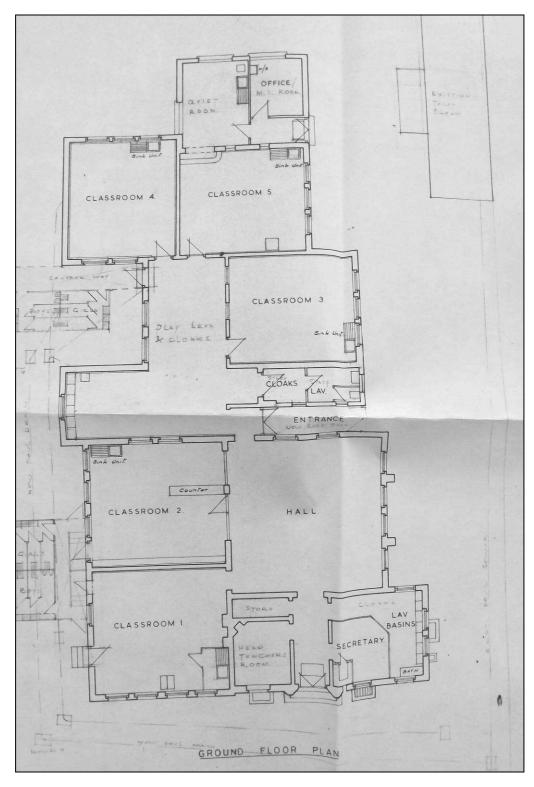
Plan as existing and proposed new toilets at Stafford Northfields Infants School, dated August 1972
